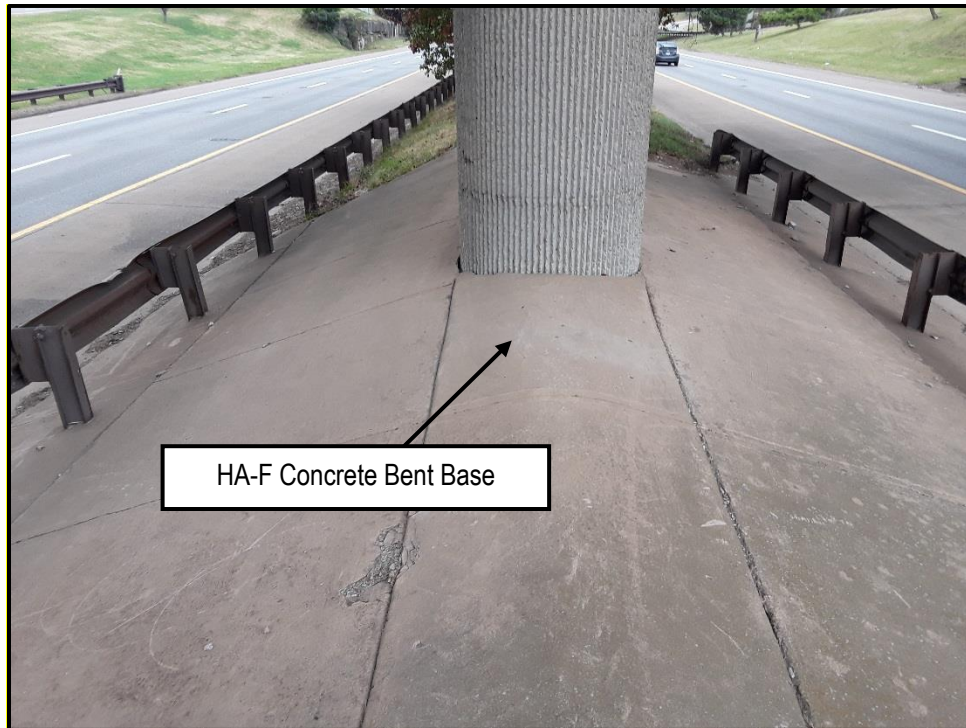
View of HA-F on the SR-1 Ramp over I-440
